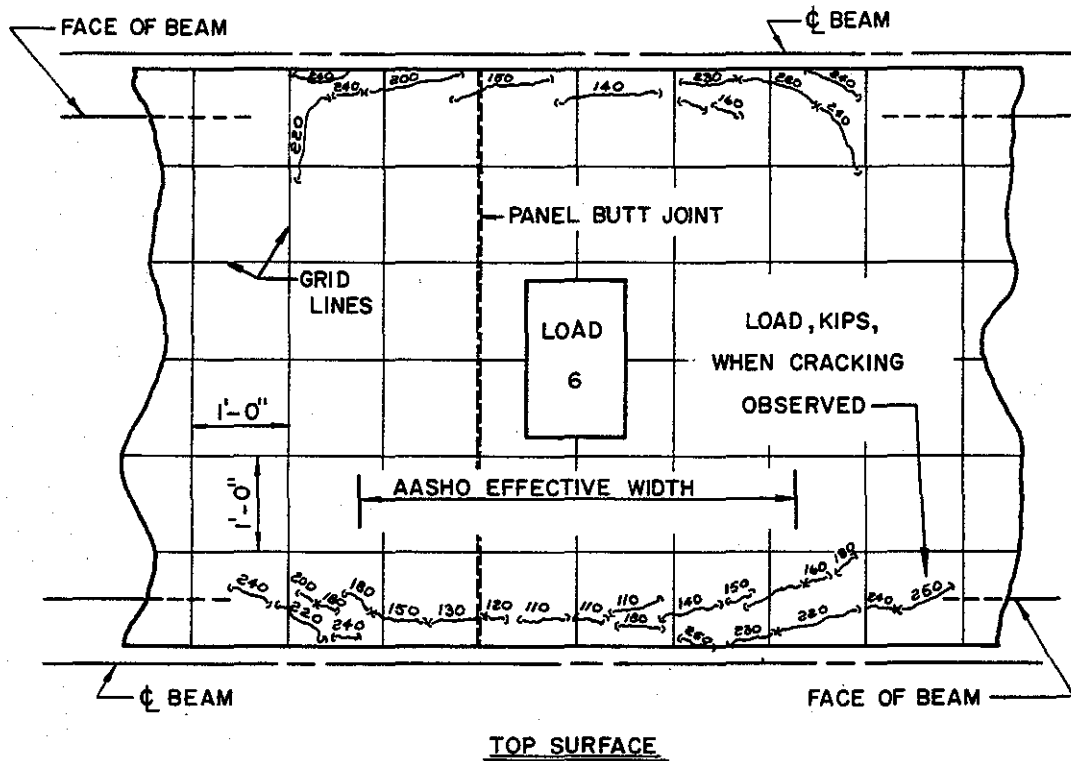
Cracking Pattern Developed in Slab in Static Failure Load Test 6 and Typical of Those Obtained in Tests 5 and 8.
